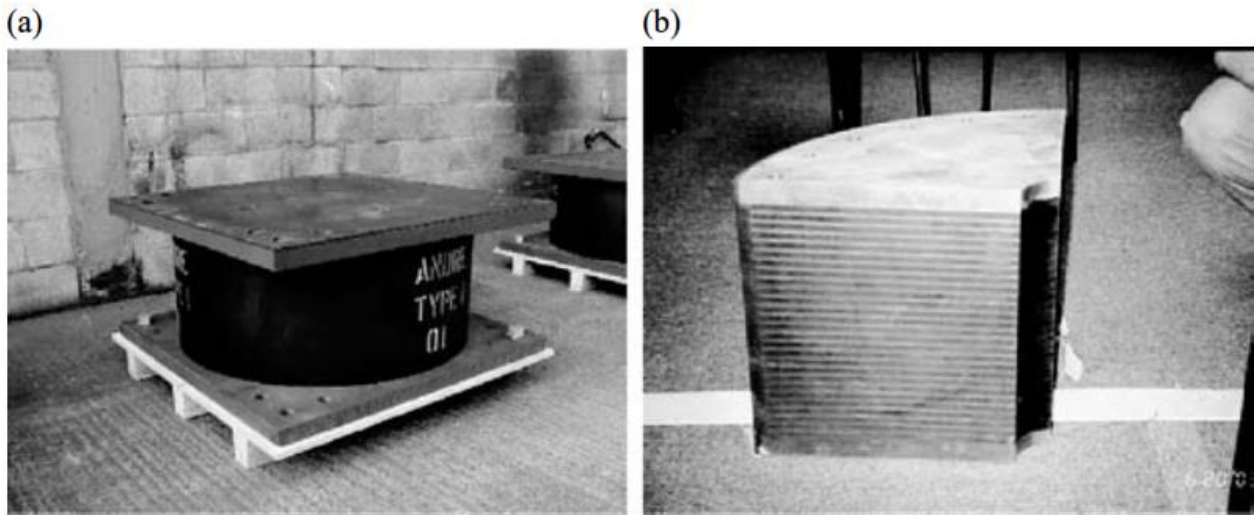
(a) High-Damping natural rubber bearing (b) a section cut
